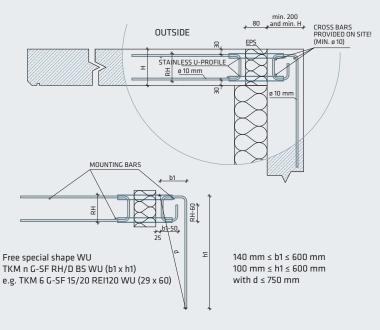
Balcony connection – wall below with free special shape  $\mbox{WU}$
